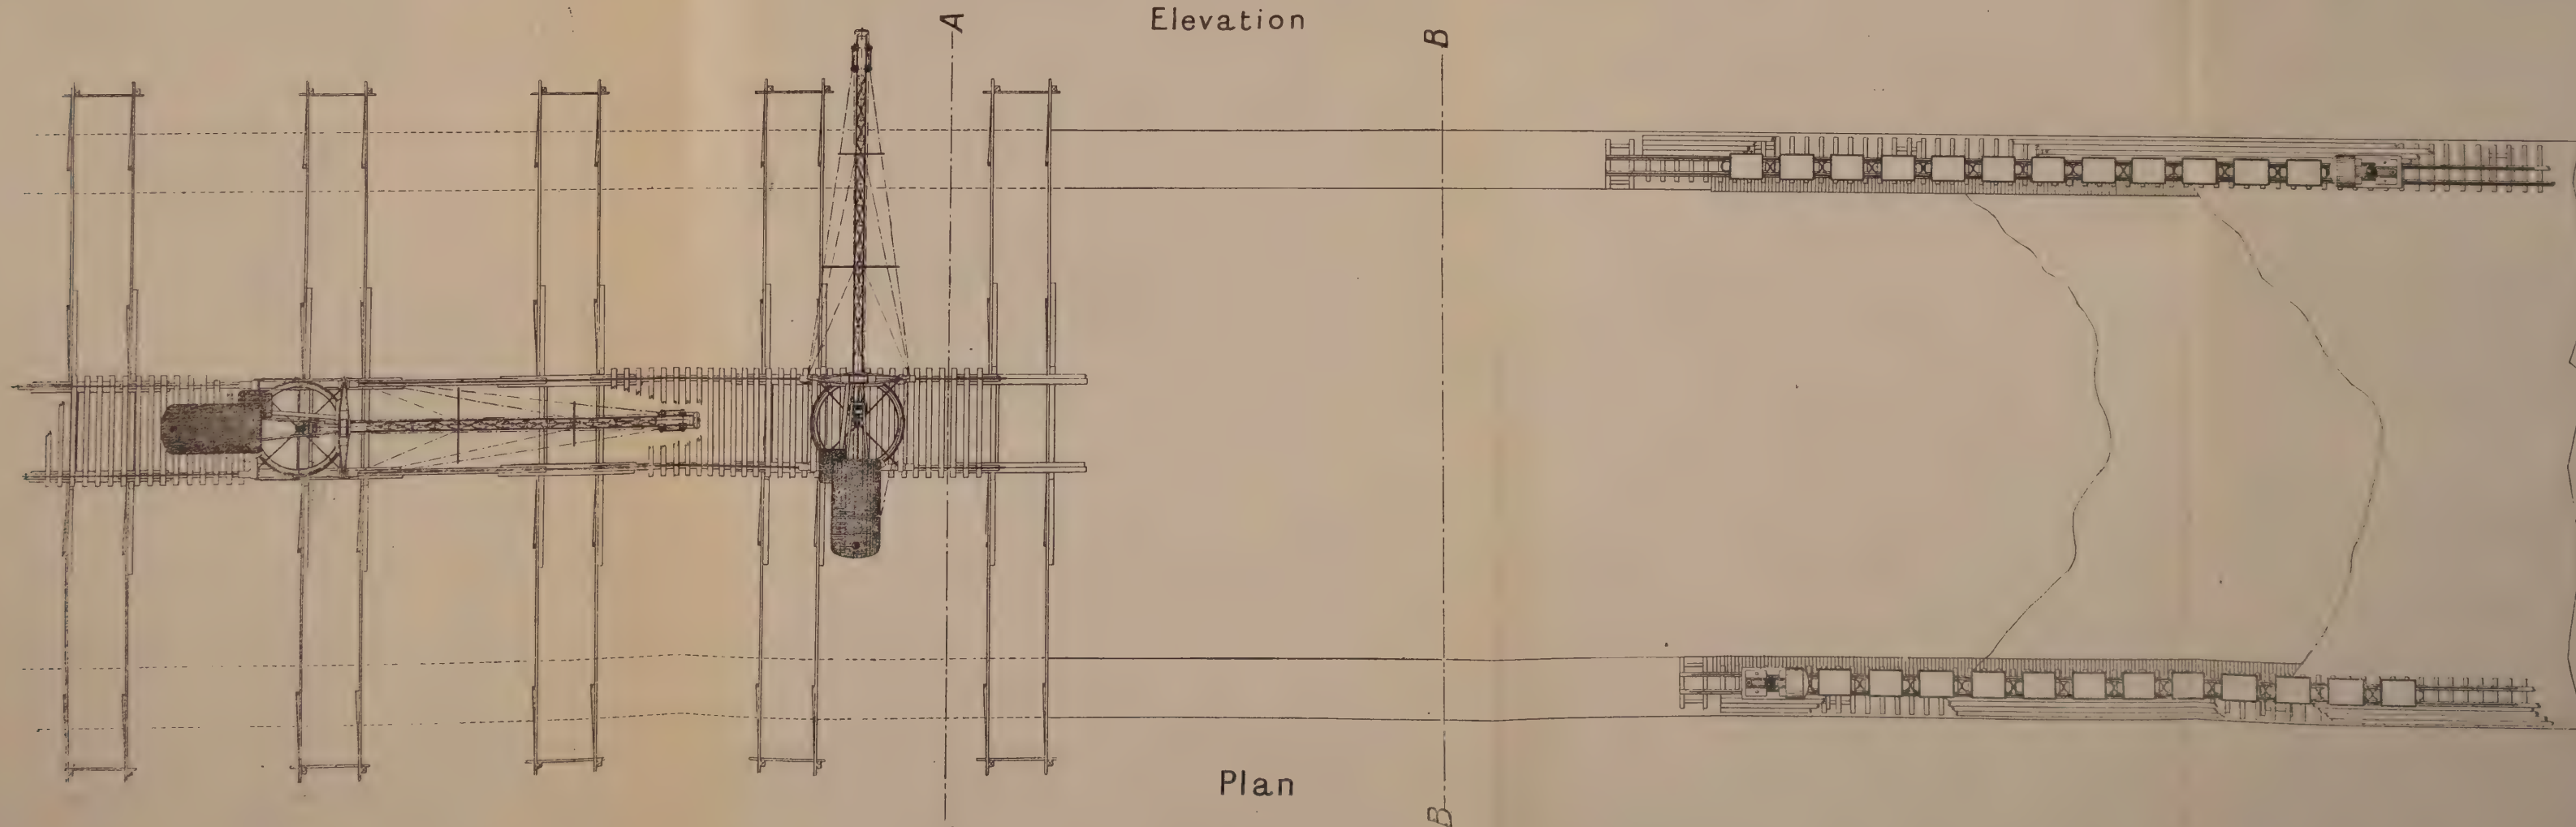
, 155, 156, and 157.—Construction Staging at Gibraltar Harbour Works.
